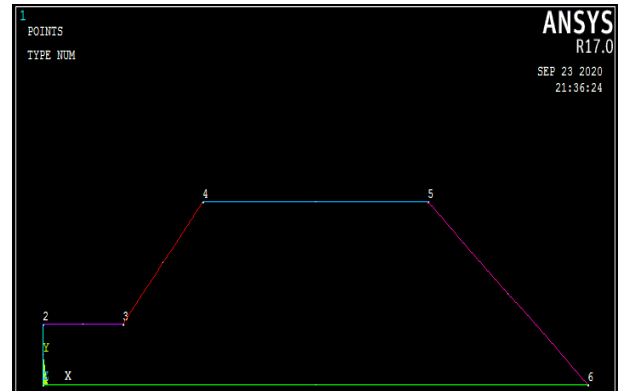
Design of retaining walls used at the Manokwari Landfill [1]
